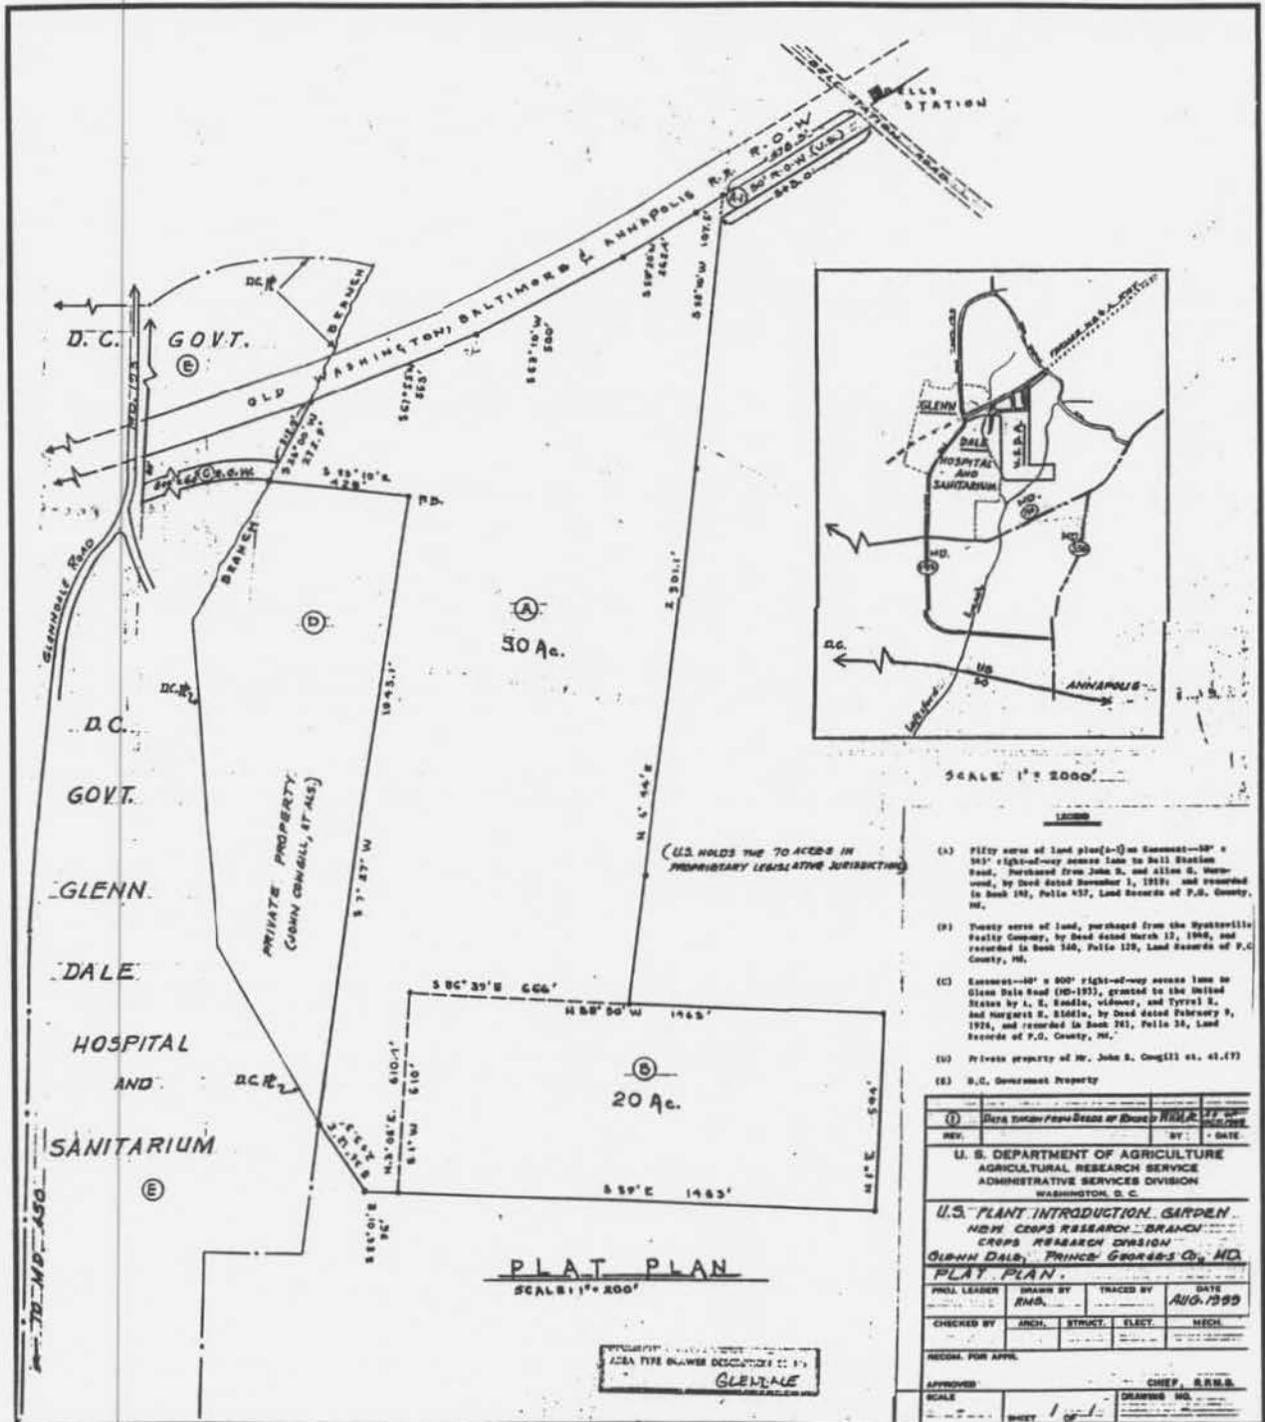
Site plan of the U.S. Plant Introduction Station, Glenn Dale, Maryland, 1959. Source: Division of Facilities and Engineering, Building 426, Beltsville Agricultural Research Center, Beltsville, Maryland.
